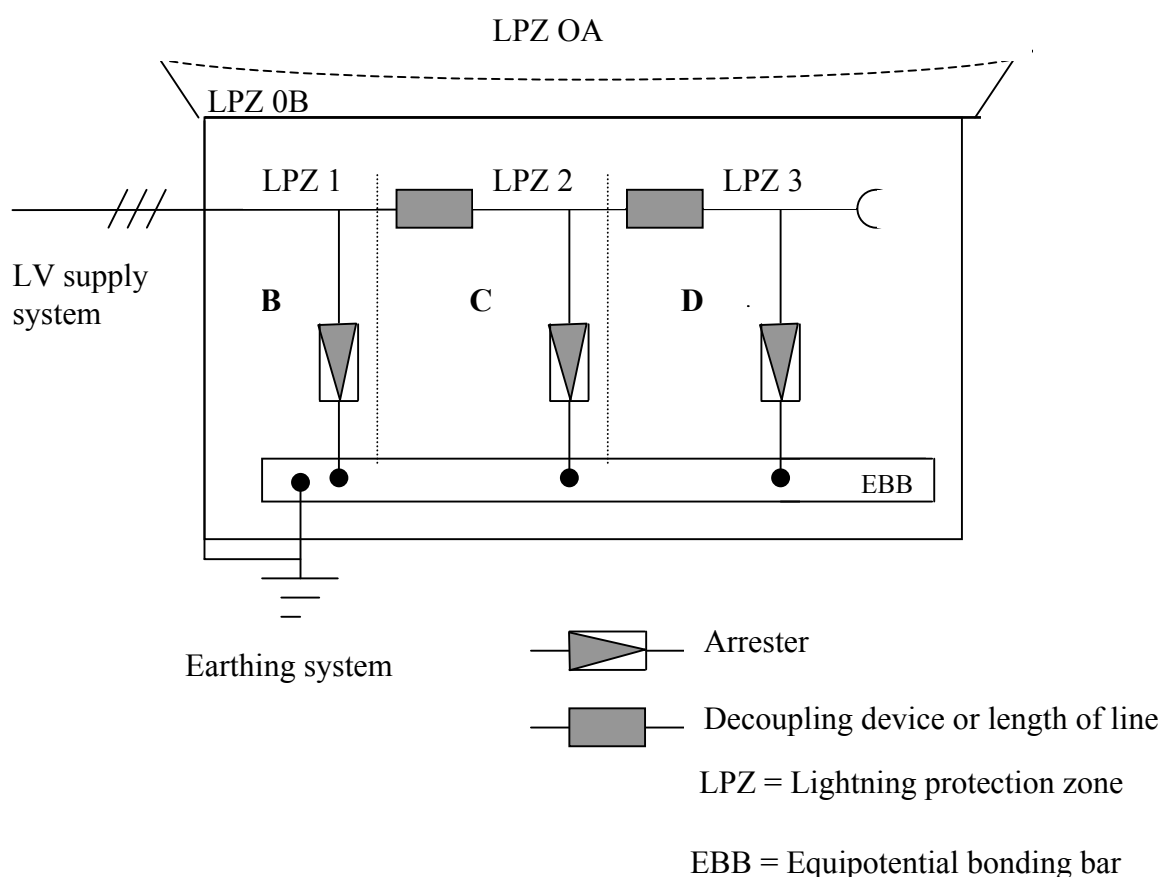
dividing the building into different lightning protection zones with arresters in place
